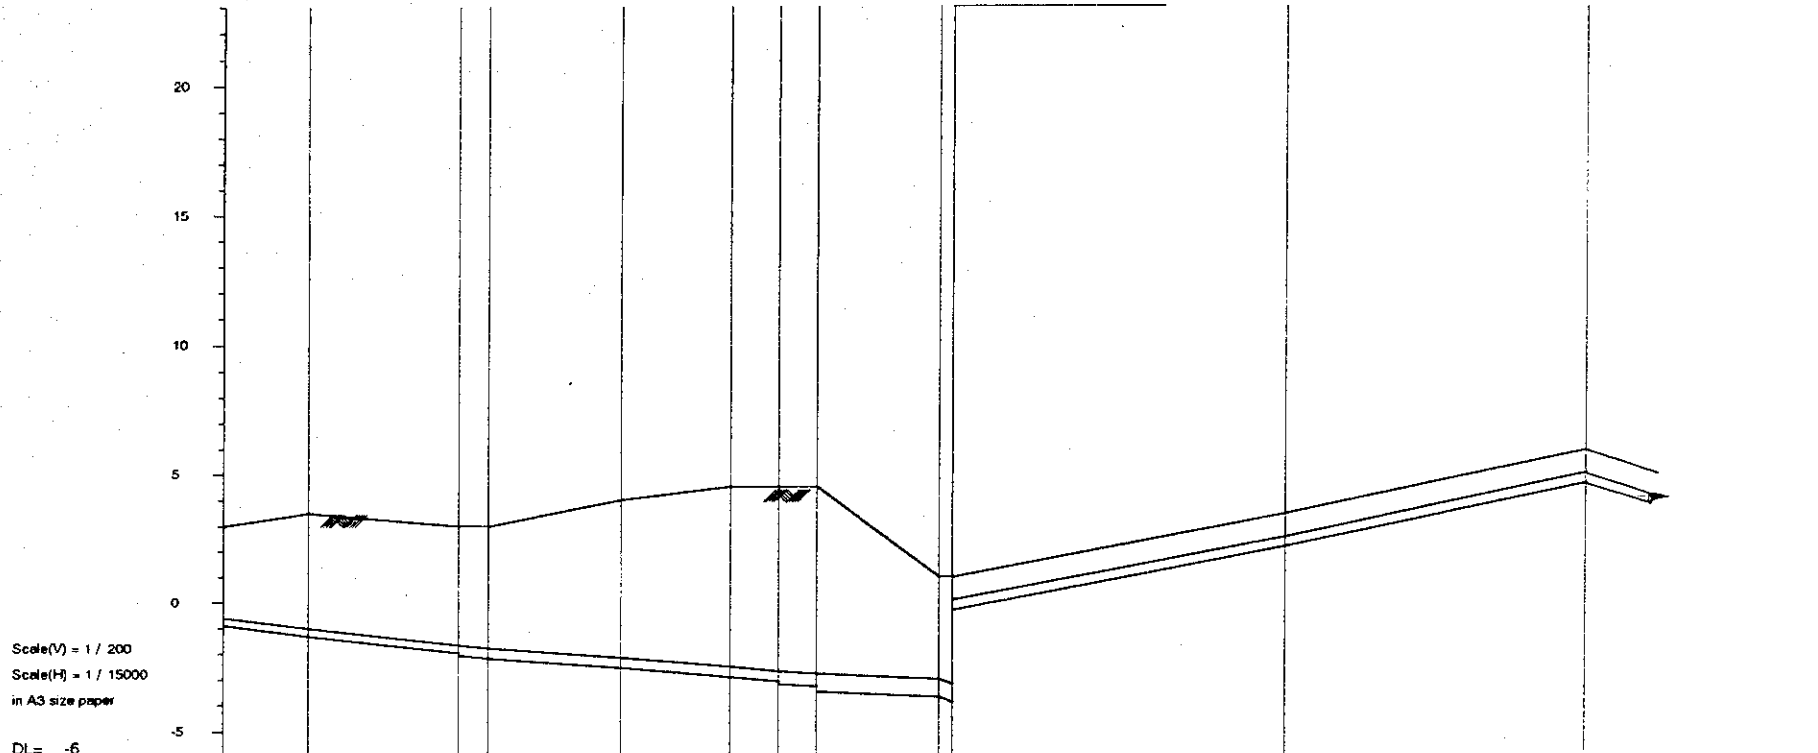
Longitudinal Profile of Proposed Sewer to Janga 4
